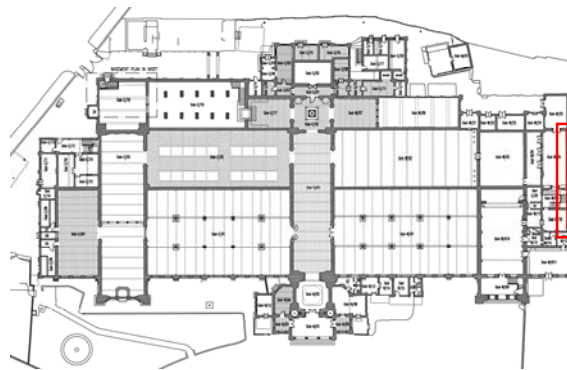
Key Plan showing wall Gnd-W/05-W-W
